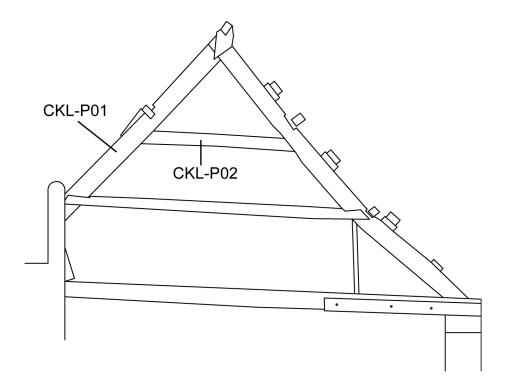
Truss 2 looking south, showing the location of samples CKL-P01 and CKL-P02 (after lan Wells)
